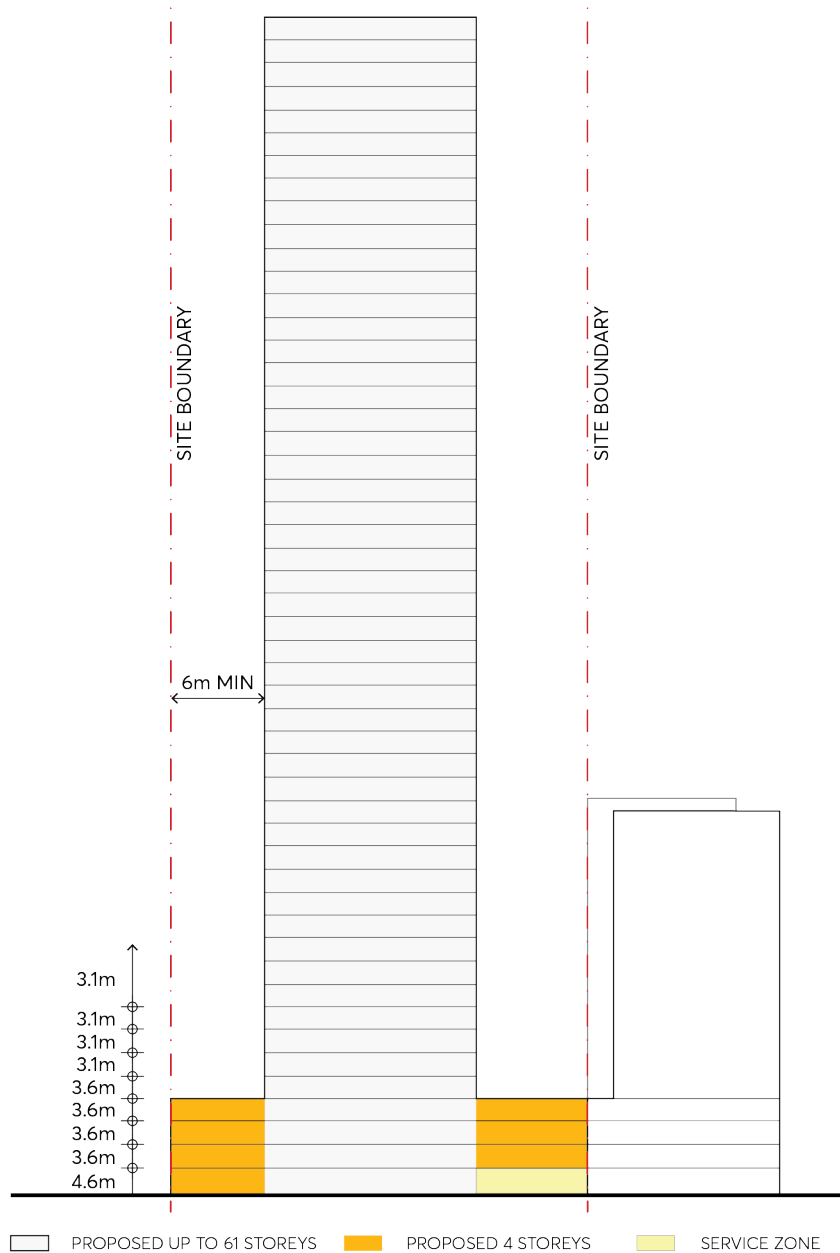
Built form Elevation and floor to floor heights
